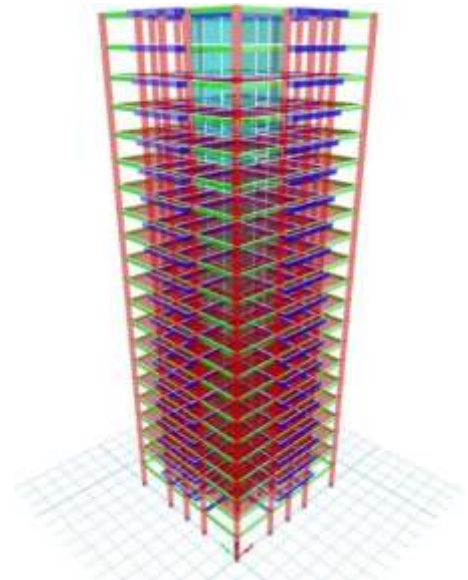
3D view of external steel beam-concrete column hybrid structure
